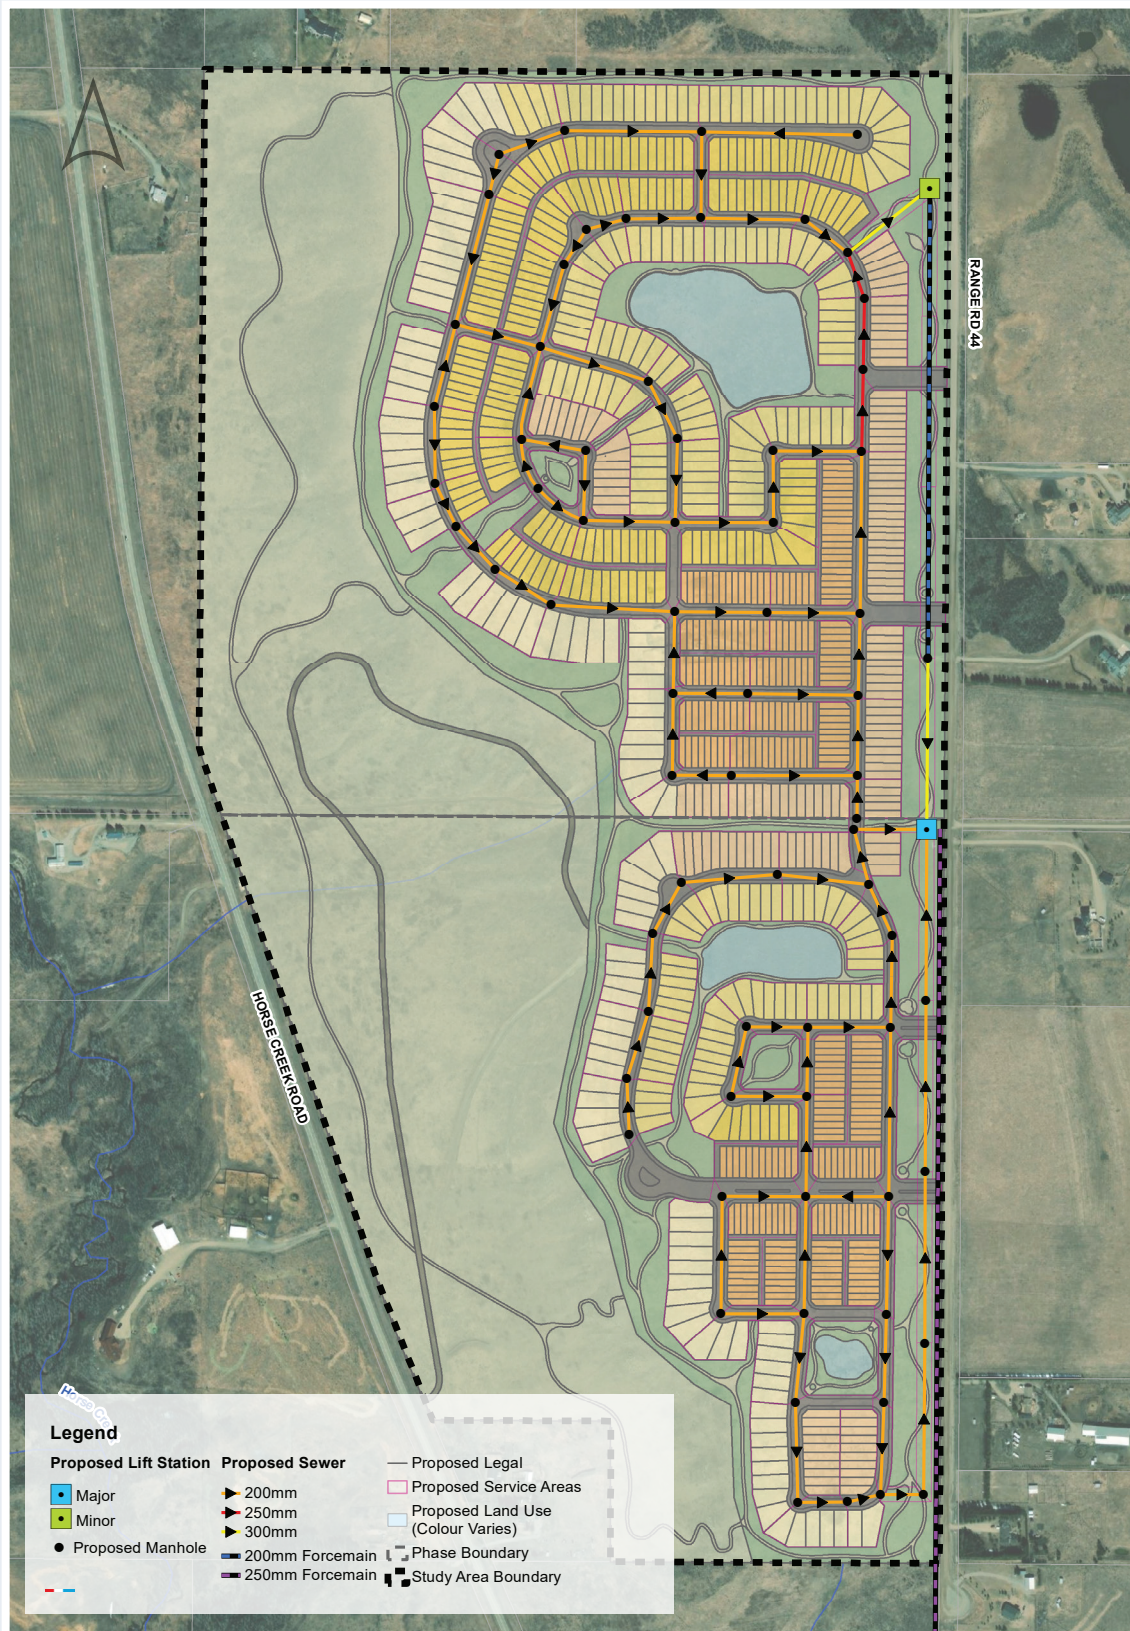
Wastewater Servicing Plan Scenario 2, Plan Area
